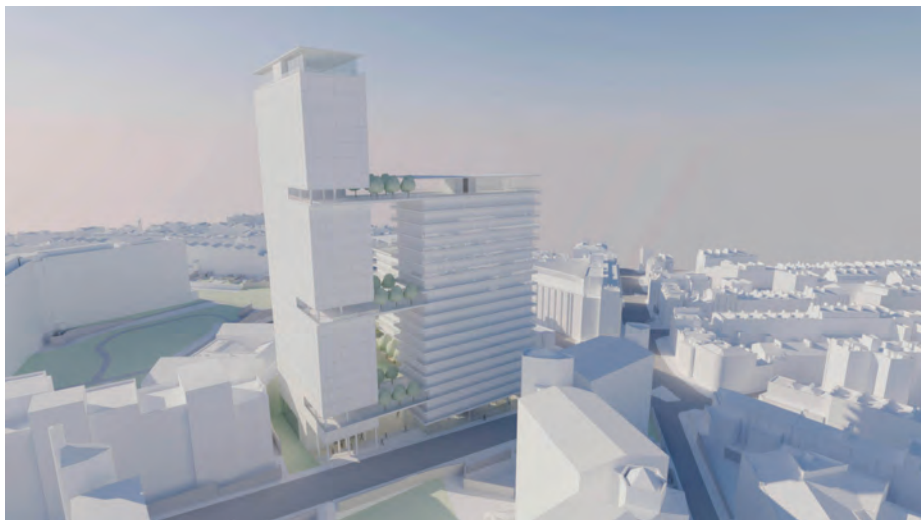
Penton Place, London (Source: Stephan Reinke Architects)
